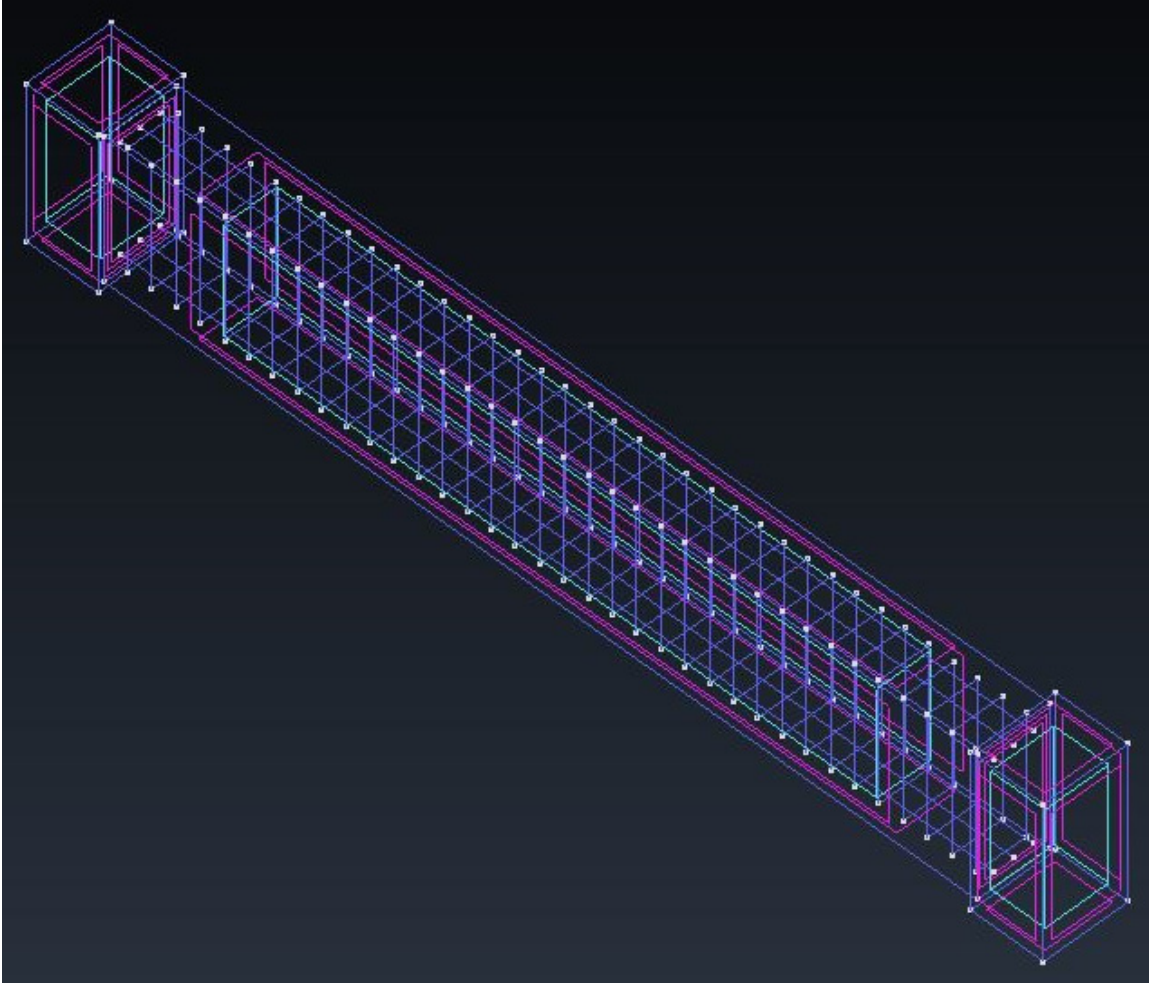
Parametric study finite-element model layout (24FB60)
